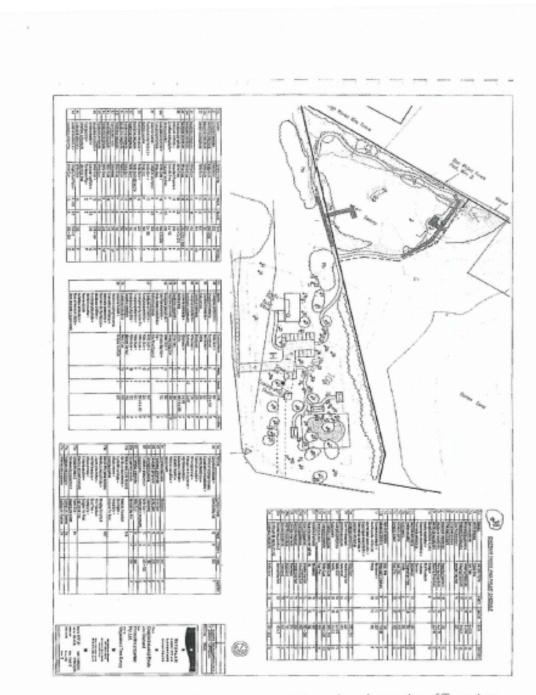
Draft Landscape Plan for proposed Upgrade and extension of Teamsters
